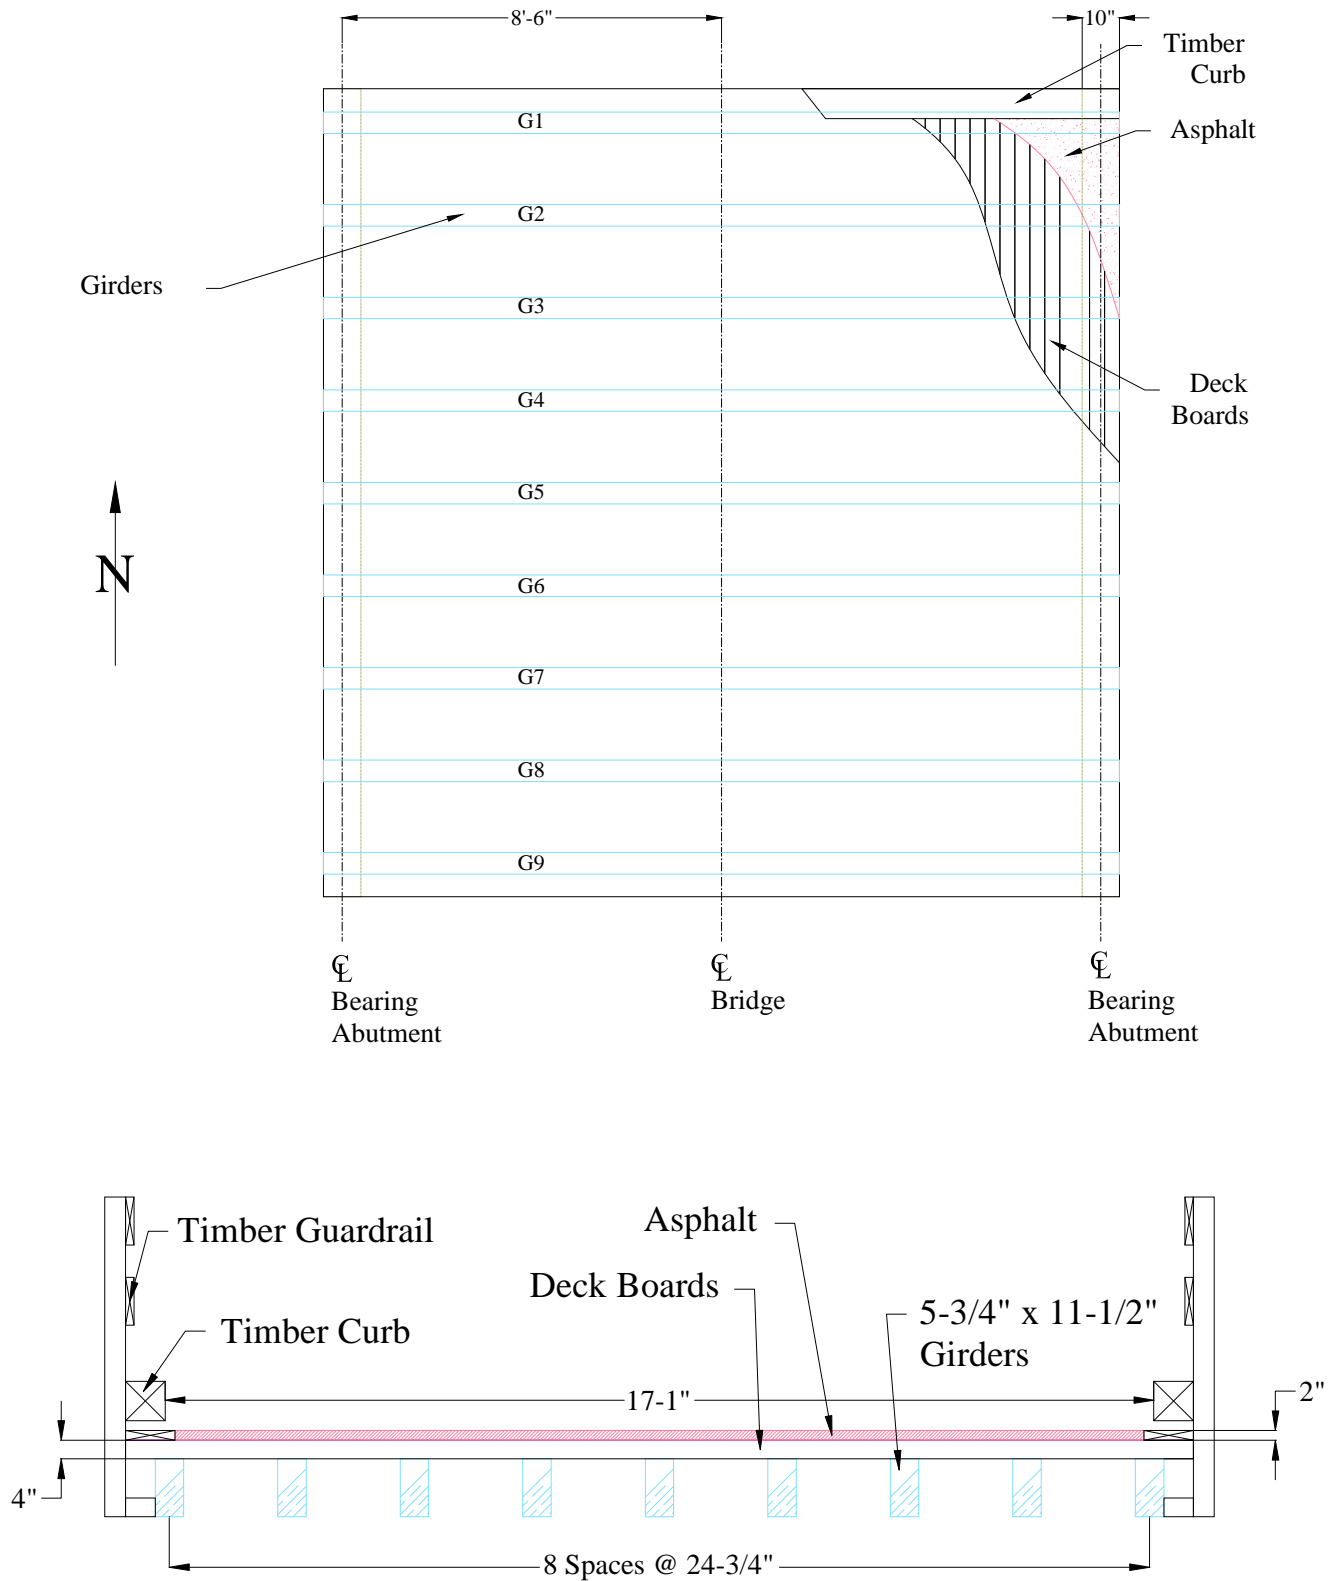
Plan and Profile Layout of Dix Creek Bridge
